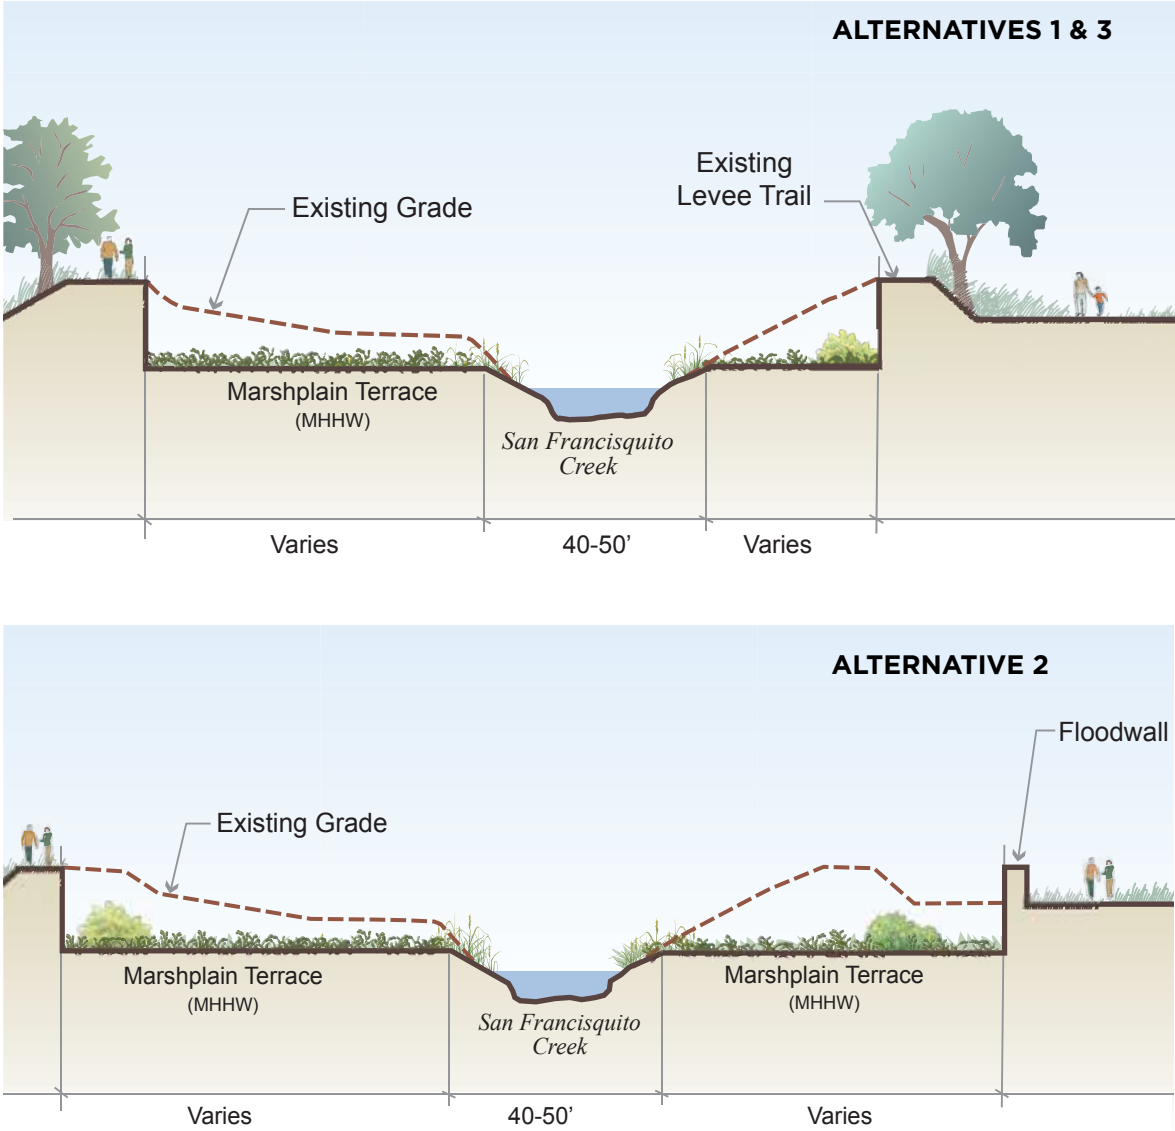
| CROSS SECTION B, VIEW LOOKING DOWNTREAM
